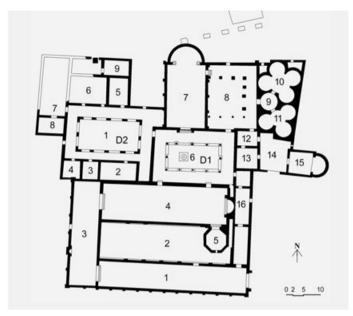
Gamzigrad, plan of palace 1 (according to ČANAK-MEDIĆ / STOJK-OVIĆ-PAVELKA 2011, 89 pl. XXXIV).
